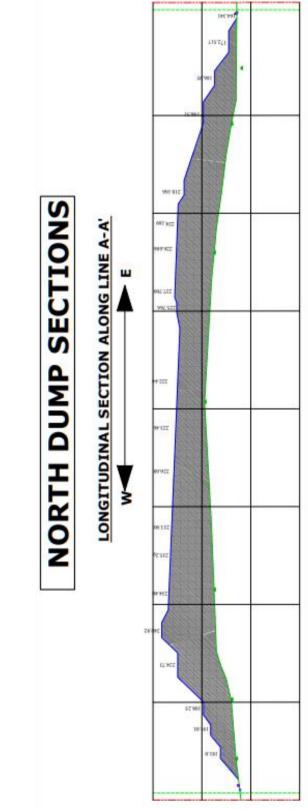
Longitudinal Section of North OB Dump along Section AA'
